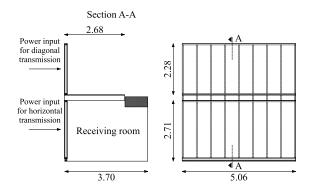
Laboratory test construction: Sketch of cross-section through T-junction (dimensions in metres).
